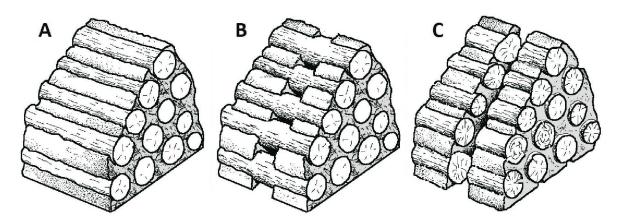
A: Single wall with logs and mortar. B: Single wall with logs, mortar and insulation. C: Double wall with mid insulation layer; source: [Szewczyk, n.d., p. 10].
